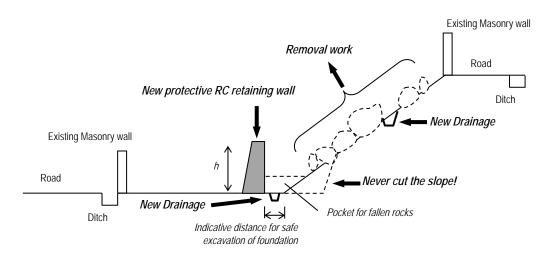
Cross section of the recommendation for countermeasure works (Source: JET)
